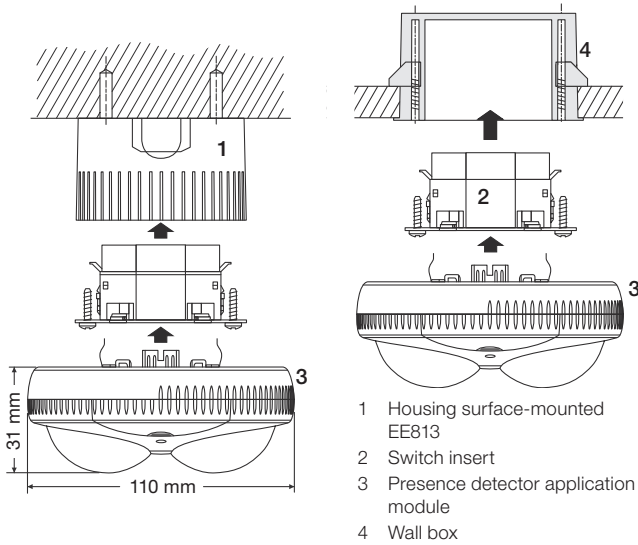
Installation in suspended ceiling or in wall-mounted housing EE813
